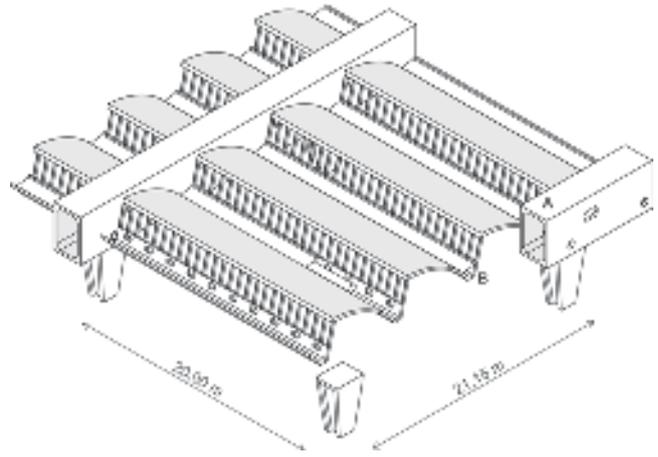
Perugia factory in Perugia, structure of the manufacturing building (drawing by the authors): thin vaults are supported by box beams (A), cross connected by hollow beams (B).
